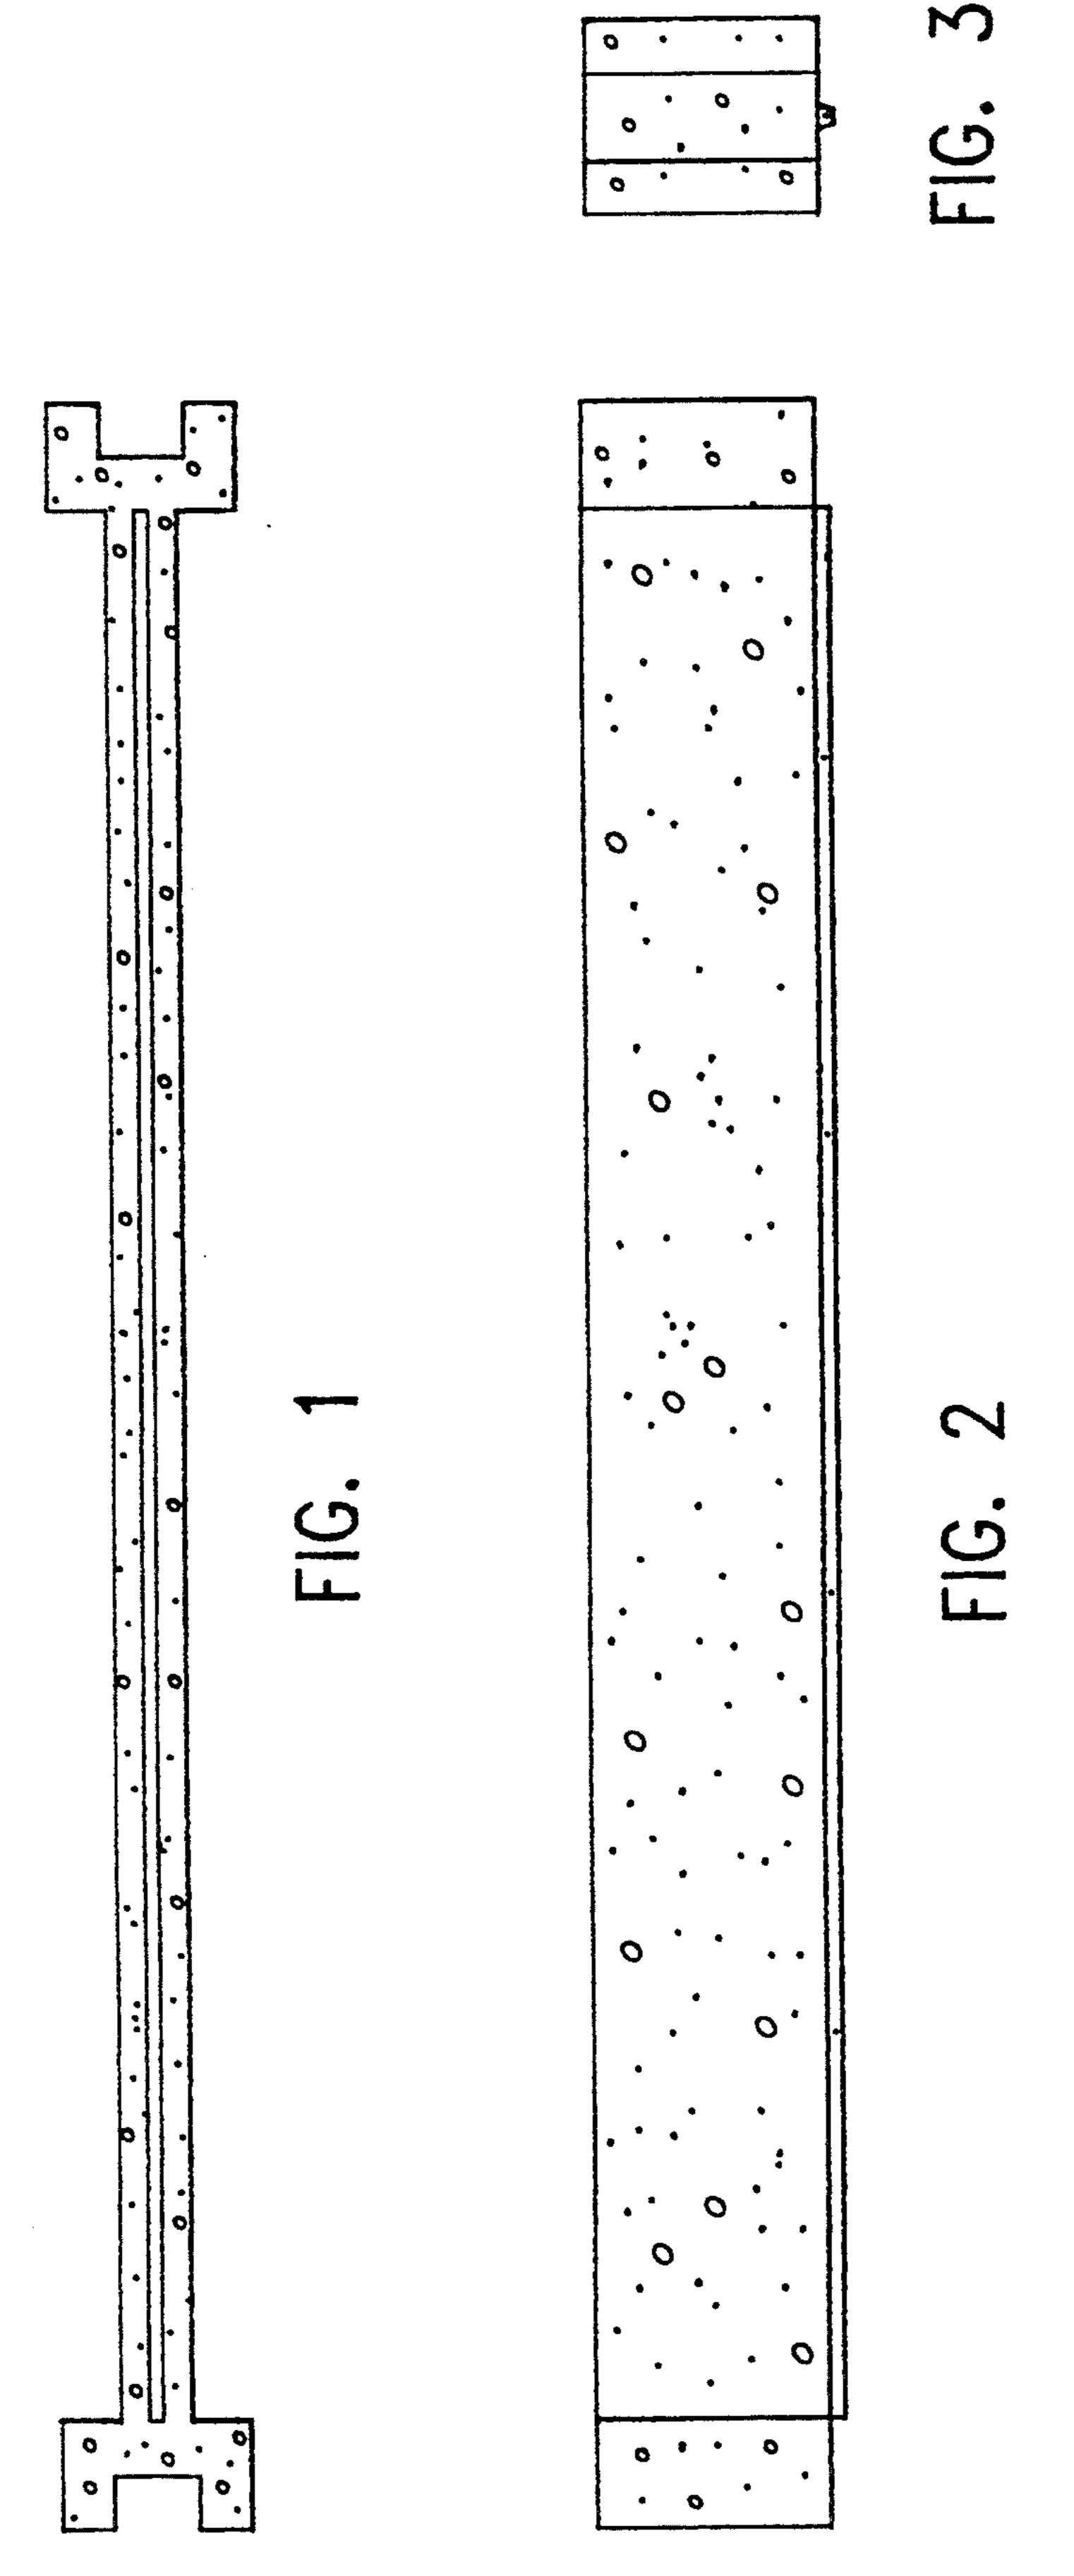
is an elevational view showing one side of the building component for a noise barrier retaining wall of the present invention;
